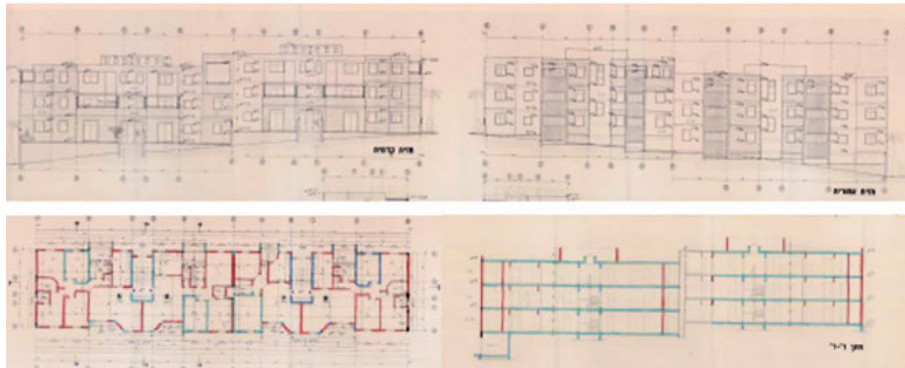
Rakevet' building, Ela'ad, 1995. (Ela'ad Construction Committee archives)
